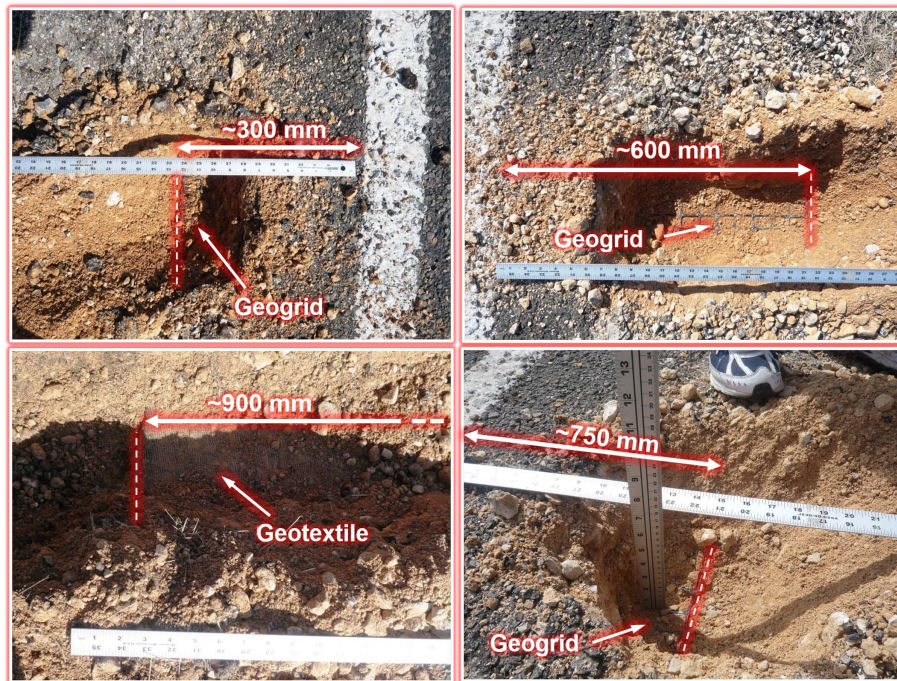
Field observations of the extent of the geosynthetic width in FM2 test sections.
